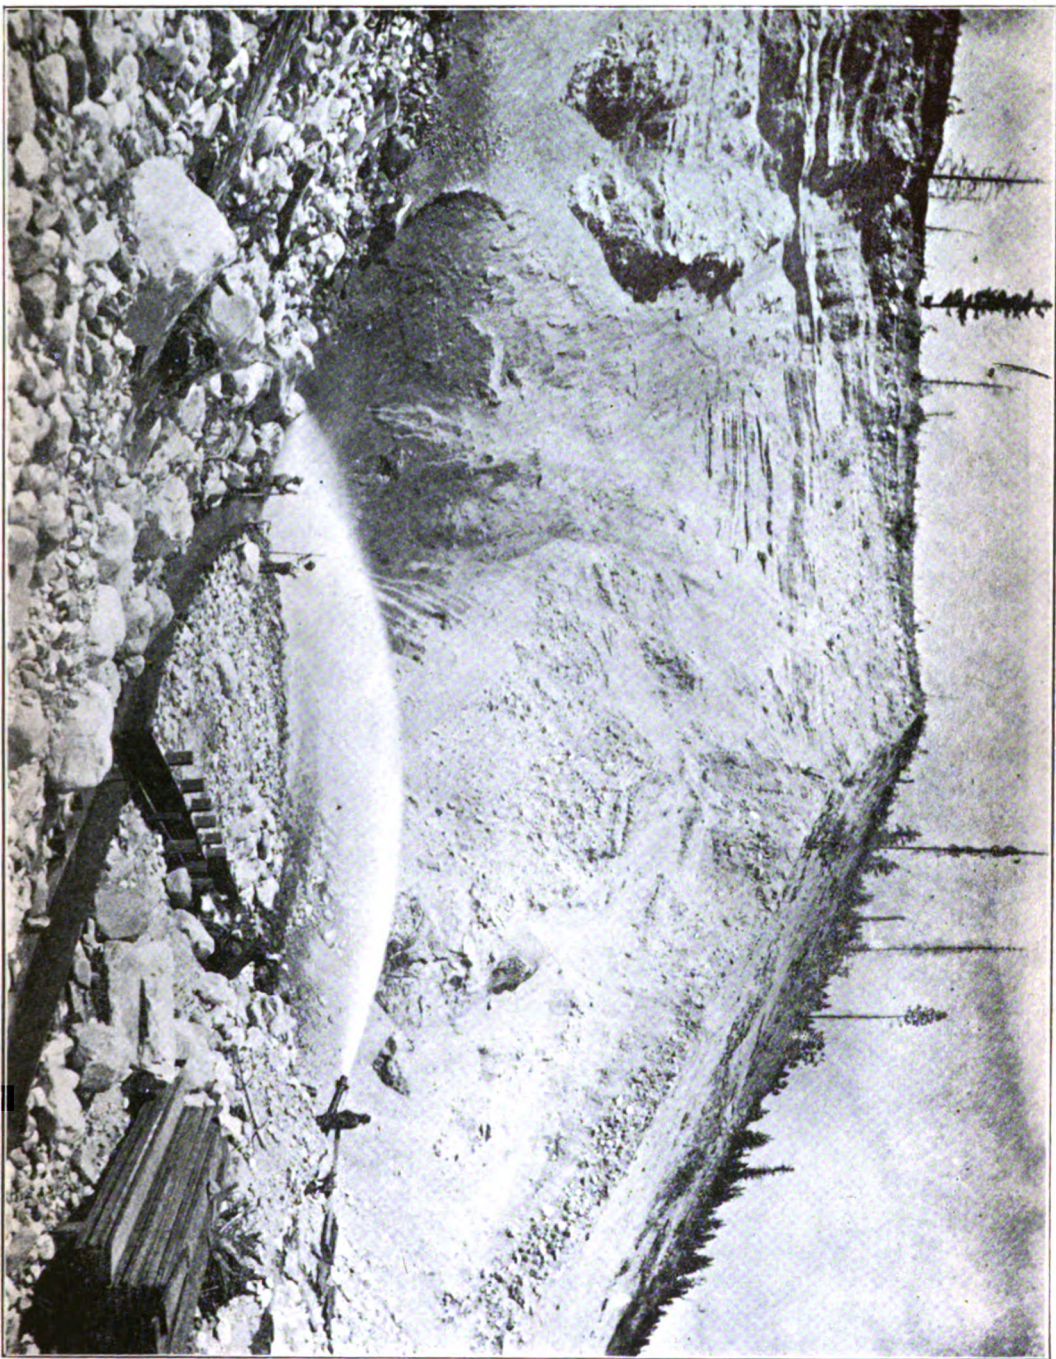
HYDRAULIC SLUICING, CANADIAN PACIFIC RAILWAY. VIEW OF PIT, AND HYDRAULIC GIANT AT WORK
